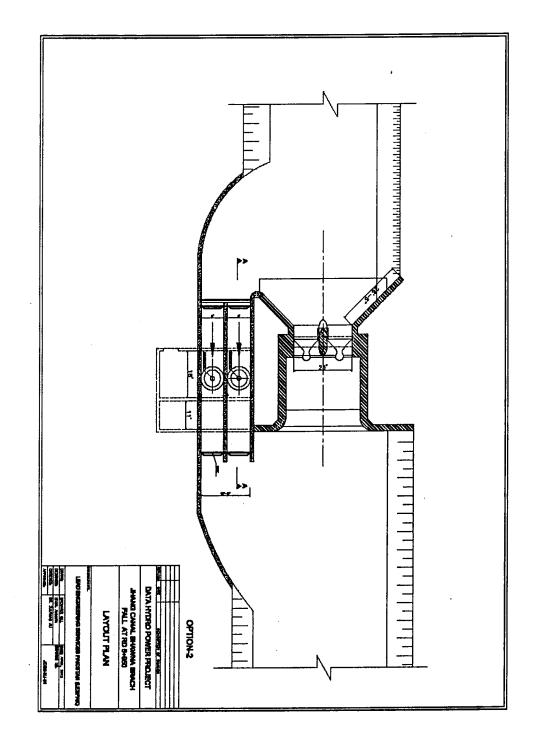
Fall at RD 7+449 (Option-2, Layout Plan)
